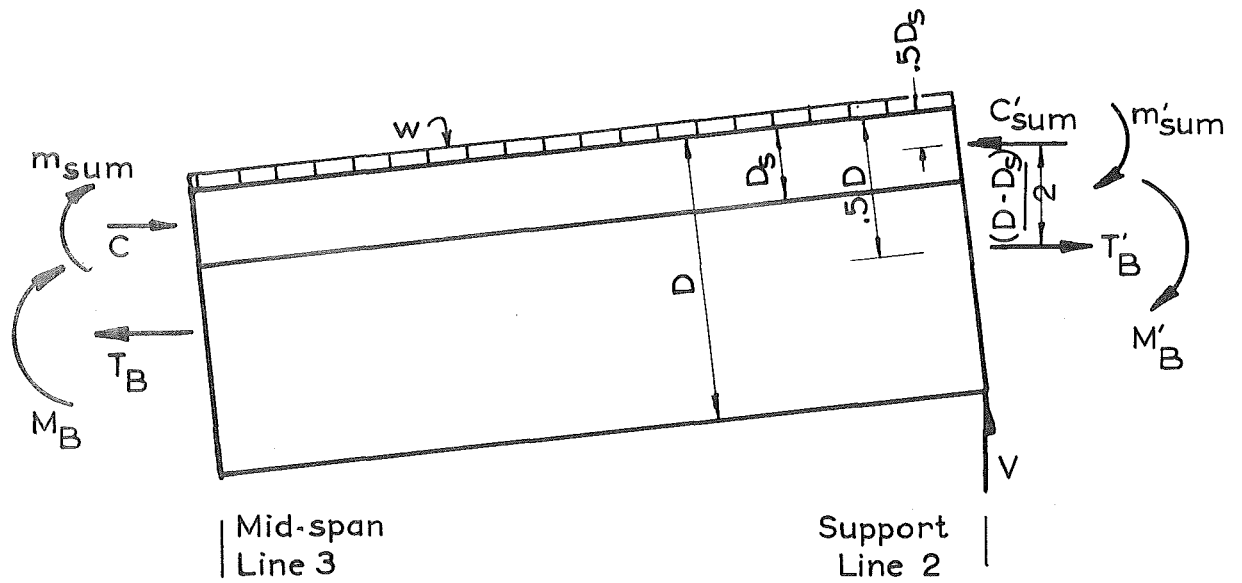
COMPUTED ACTIONS ON A TYPICAL SLAB AND BEAM ELEMENT
